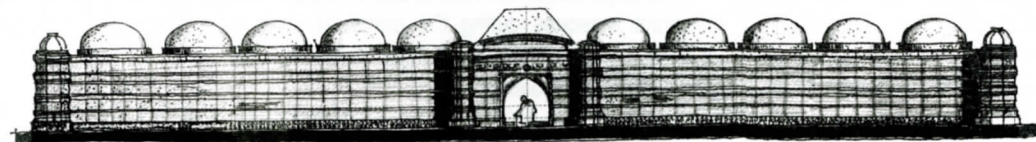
Suggestive Elevation of madrasah, showing the roofing treatment.
